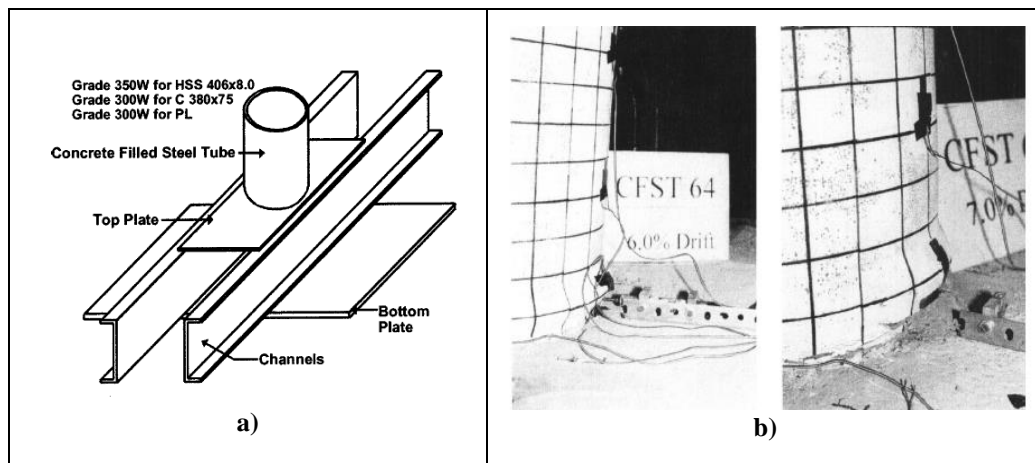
a) Detail of the base connection; b) local buckling at 6 and 7% drift.
